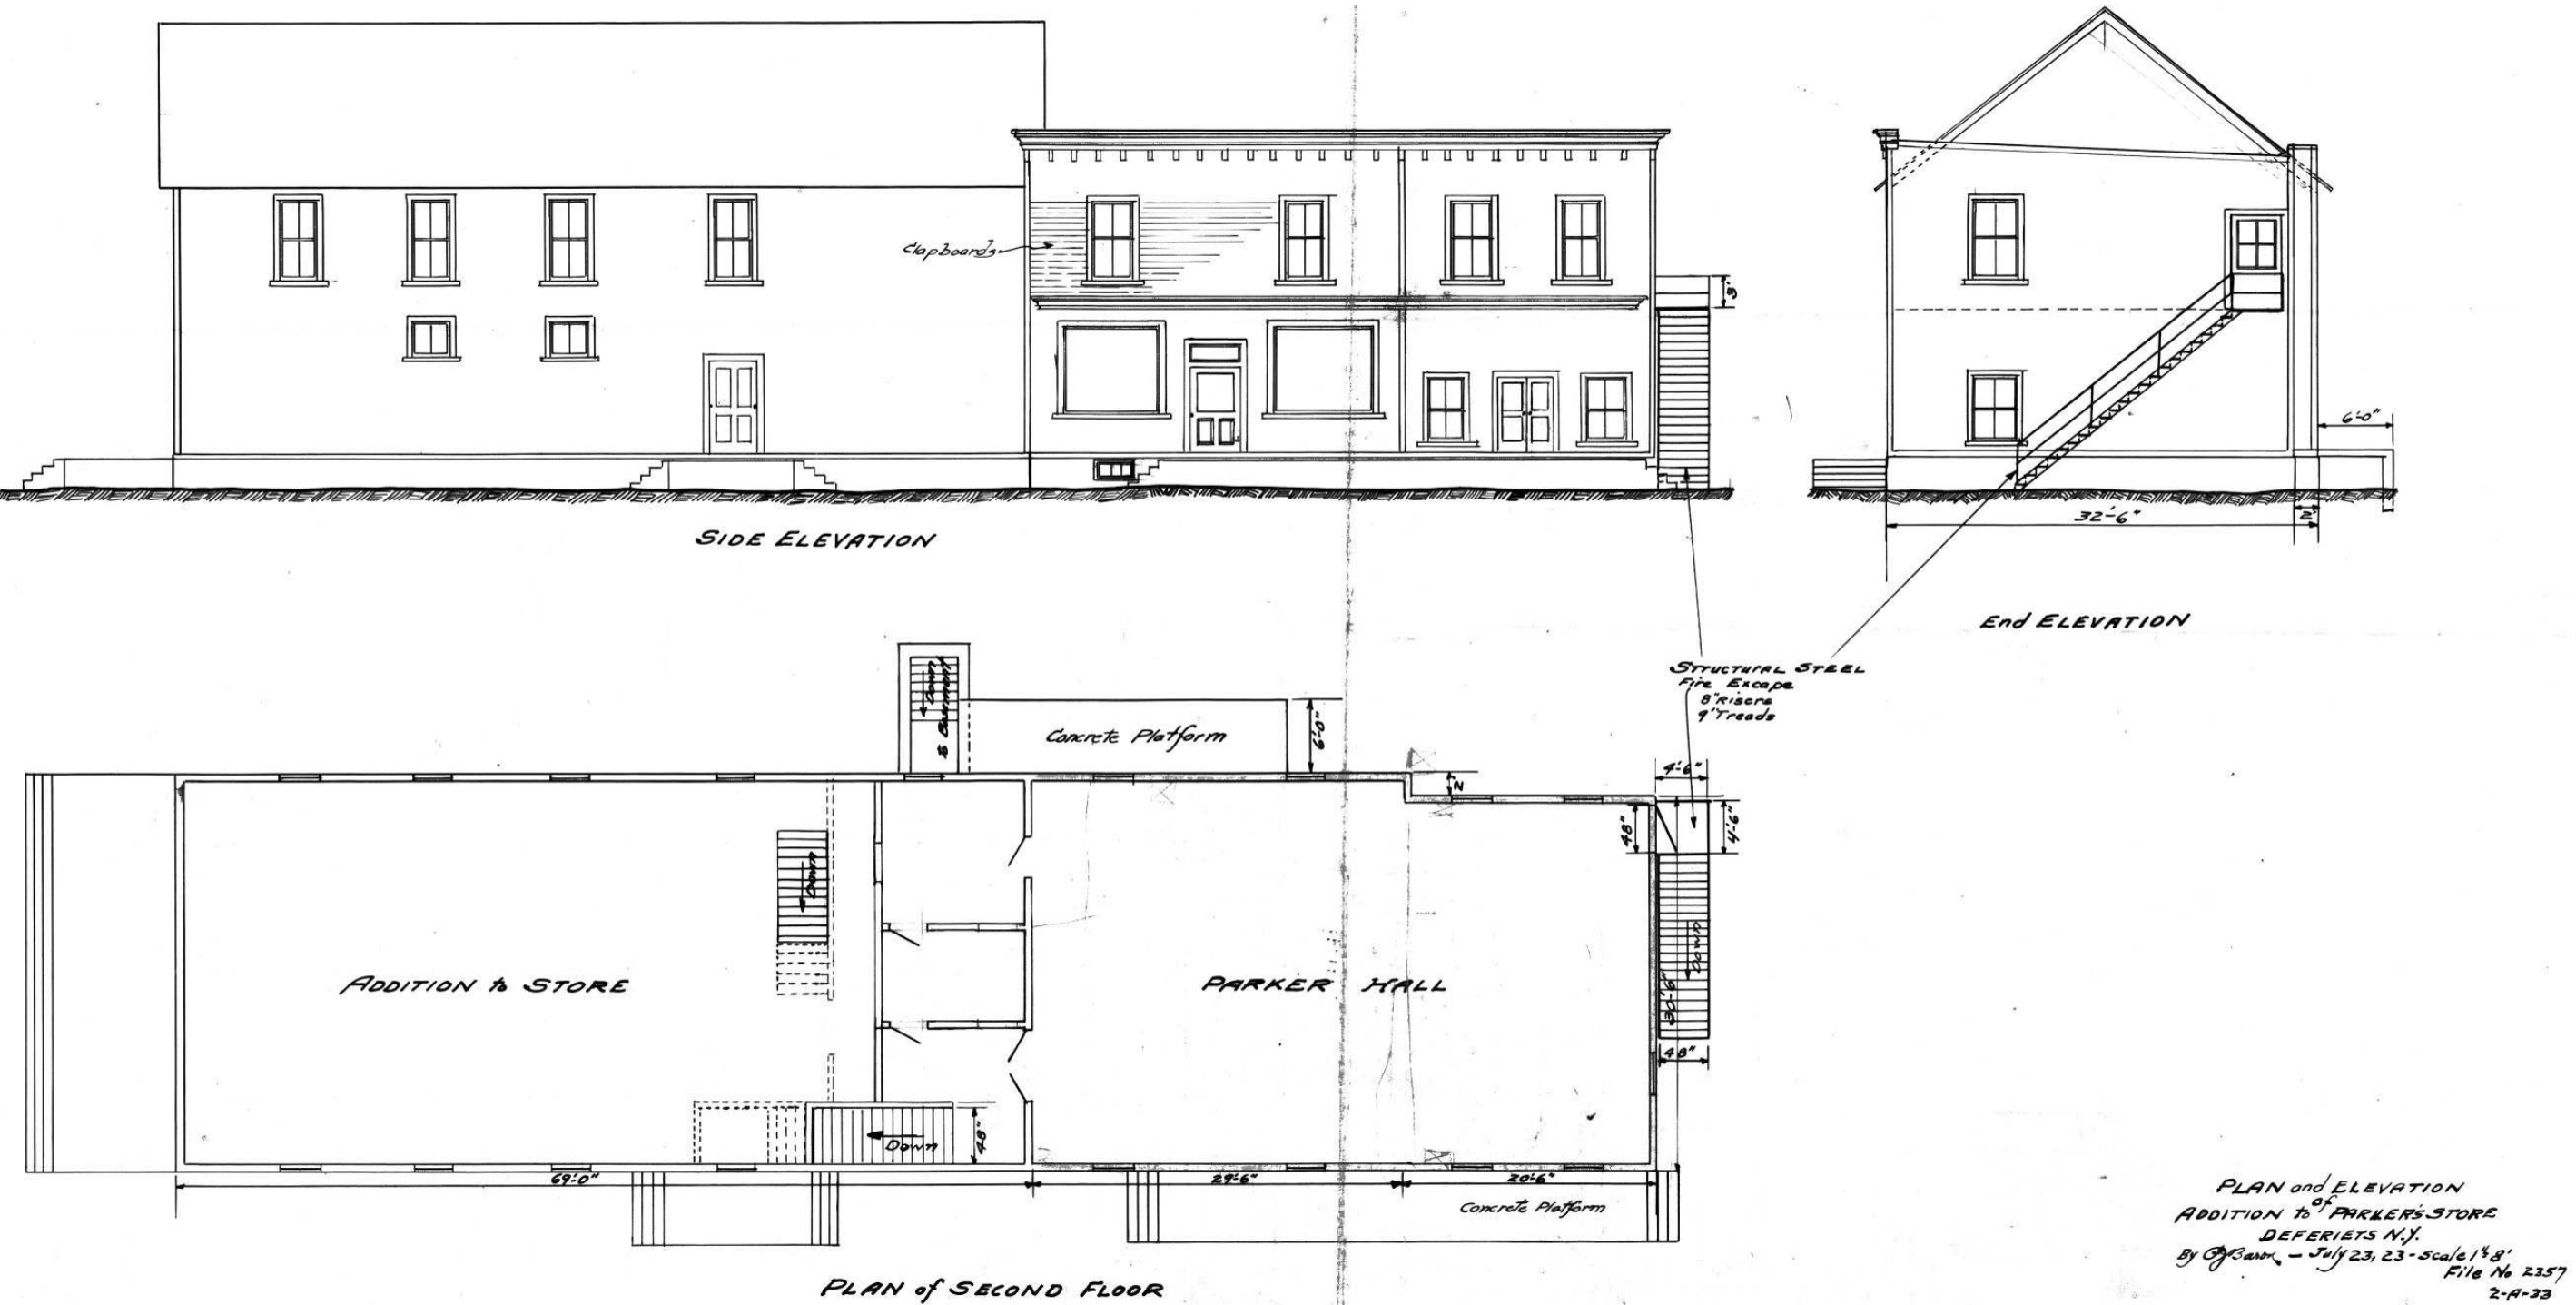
Addition floor plan and side and end elevations of Parker's Hall and store addition.
